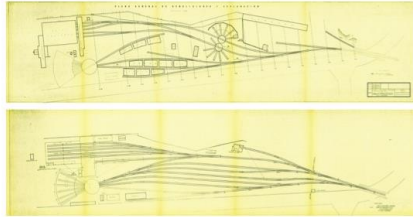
Electric traction shed Cajo. Demolition and grading plan (above) and general disposition (bottom), 1955. Source: Archivo Histórico Ferroviario, Fundación de los Ferrocarriles Españoles.
